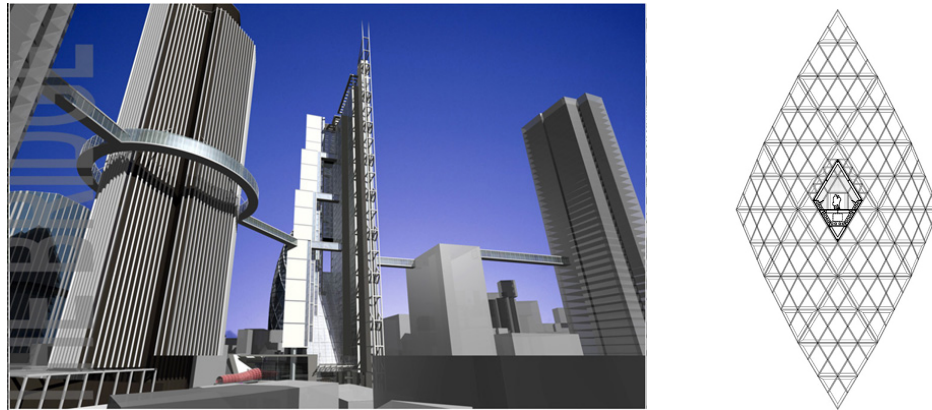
Retrospective skybridge solutions for connection to existing towers: (a) external solution for connection to Tower 42, (b) diamond solution inspired by Swiss Re Tower cladding
